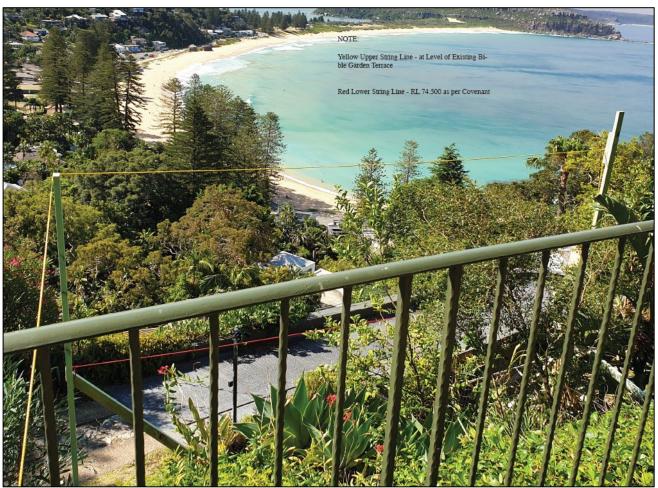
Photo shows the Height Poles installed on 6 Mitchell Road Palm Beach
